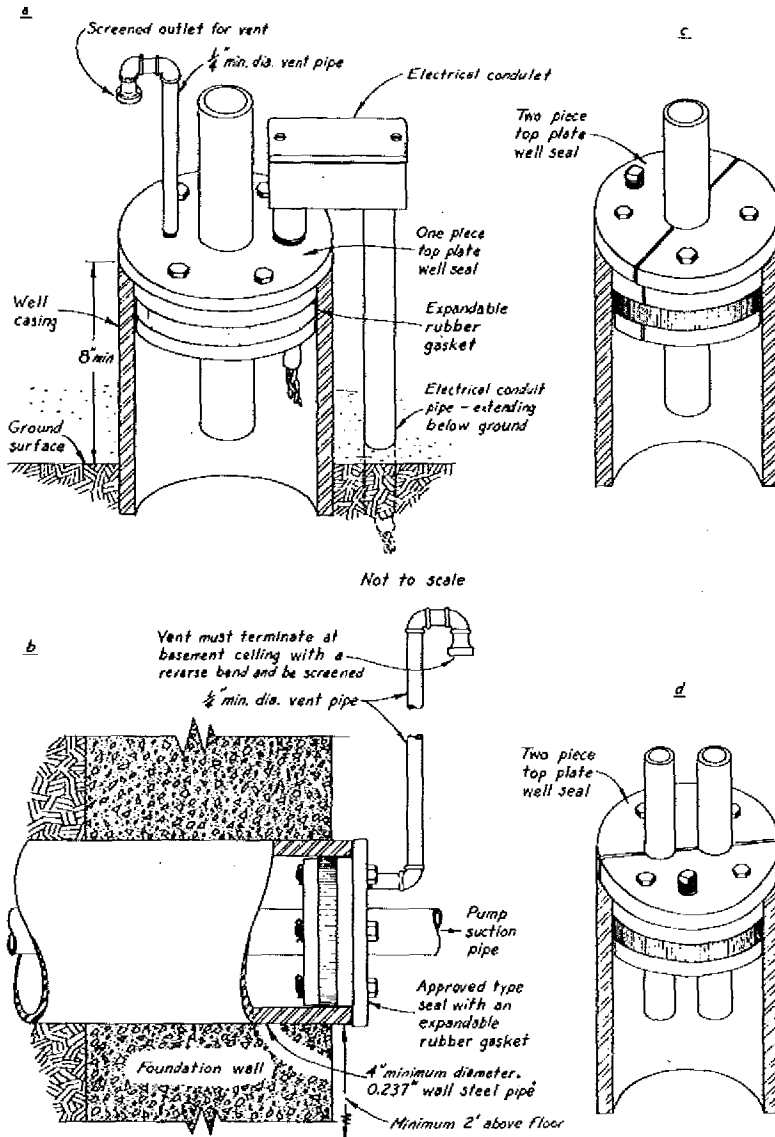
Types of Well Seals. (a) top of well seal using compressible rubber gasket. (c) and (d) also top of well seals with compressible rubber gaskets but with split top and bottom plates and gasket requiring acceptable housing protection. (b) nonpressure conduit seal using compressible rubber gasket. See NR 112.17(2) and (4).
